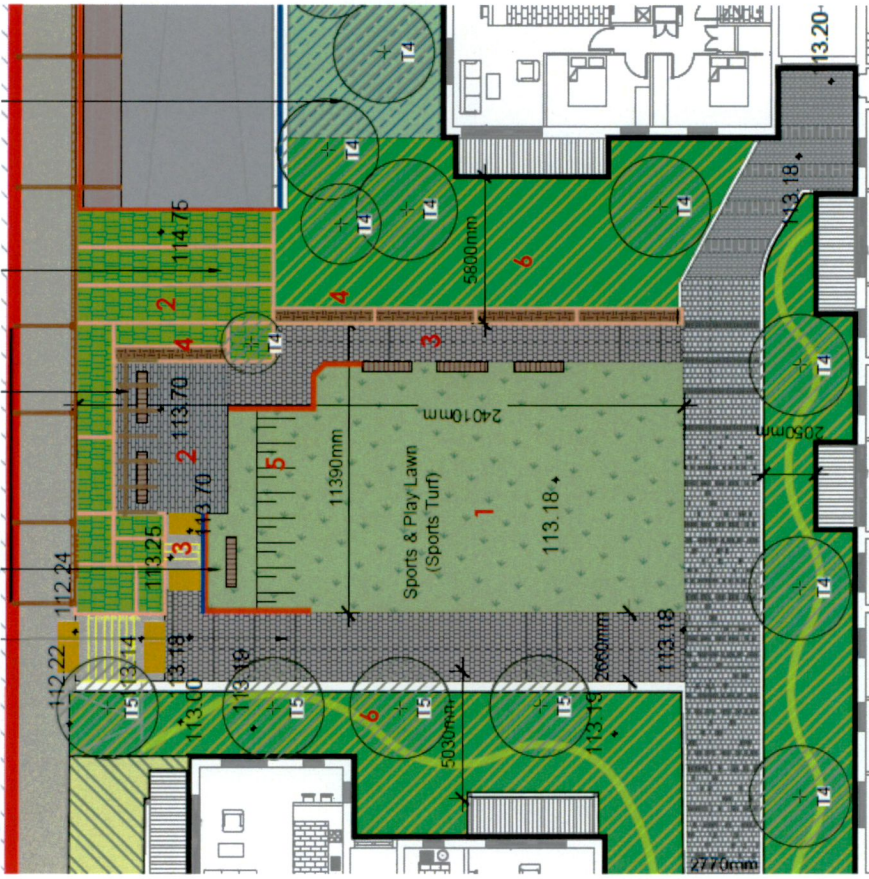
Gartners Lane Landscape Plan – rendered masterplan
